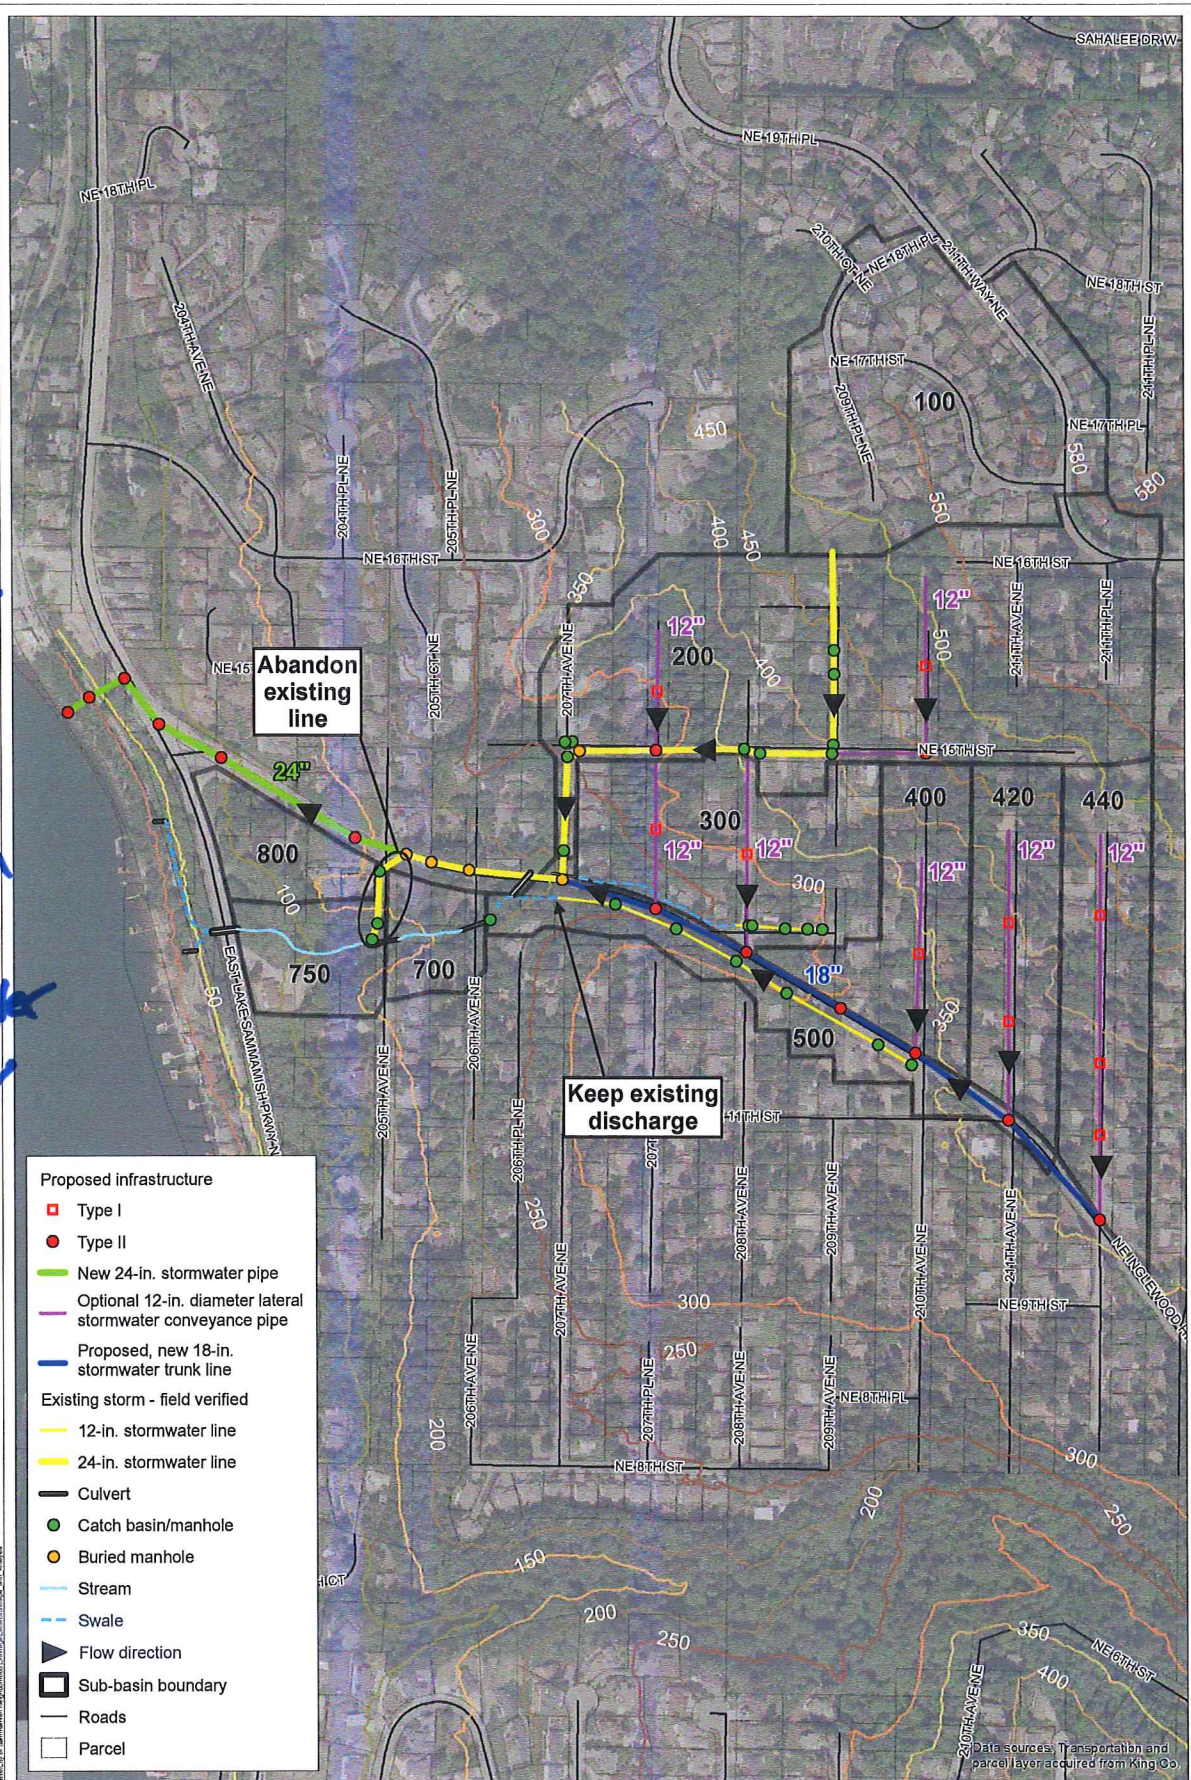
Inglewood Alternative B — connect to existing 24-in. stormwater line
